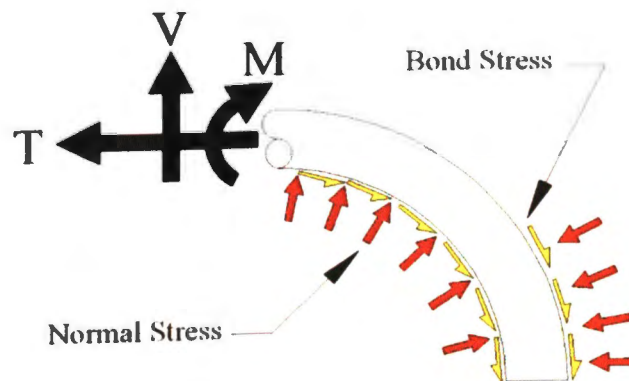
Anchor Bend Force Transfer Mechanism Reported by Orton (2007)
